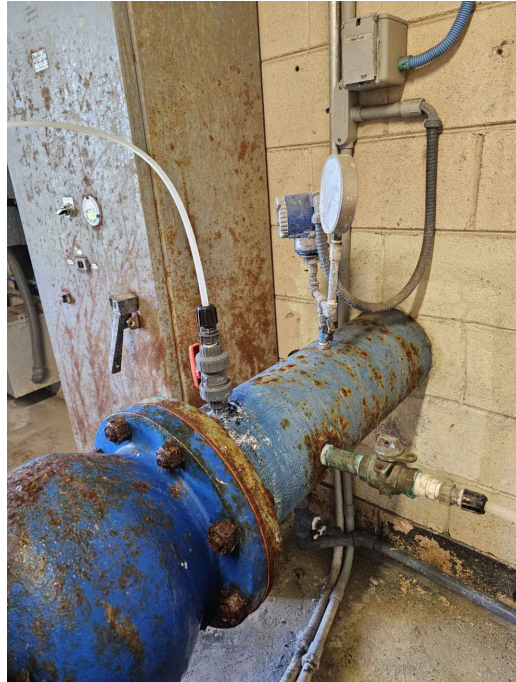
LOOKING SOUTH TOWARD WELL DISCHARGE
